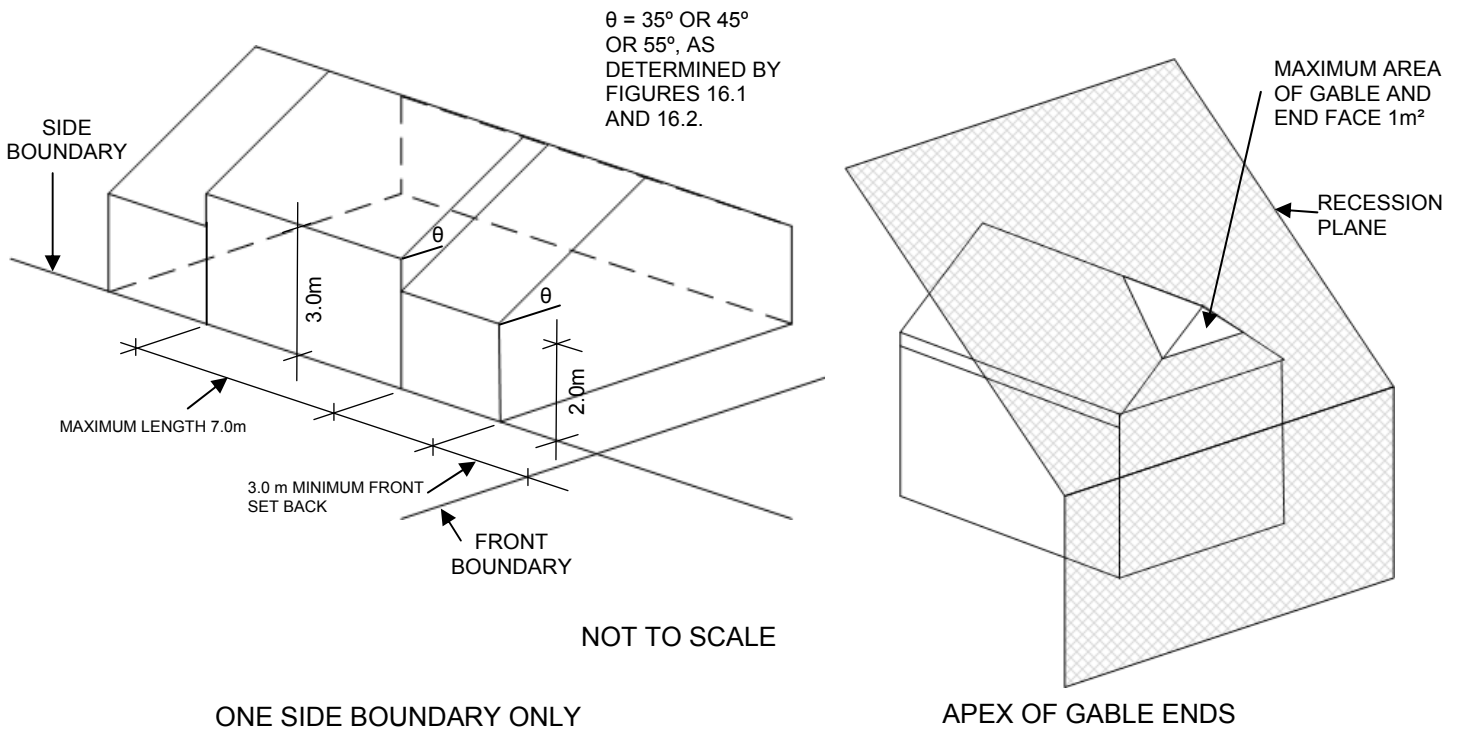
ADDITIONAL ALLOWANCE FOR BUILDING ENVELOPE
